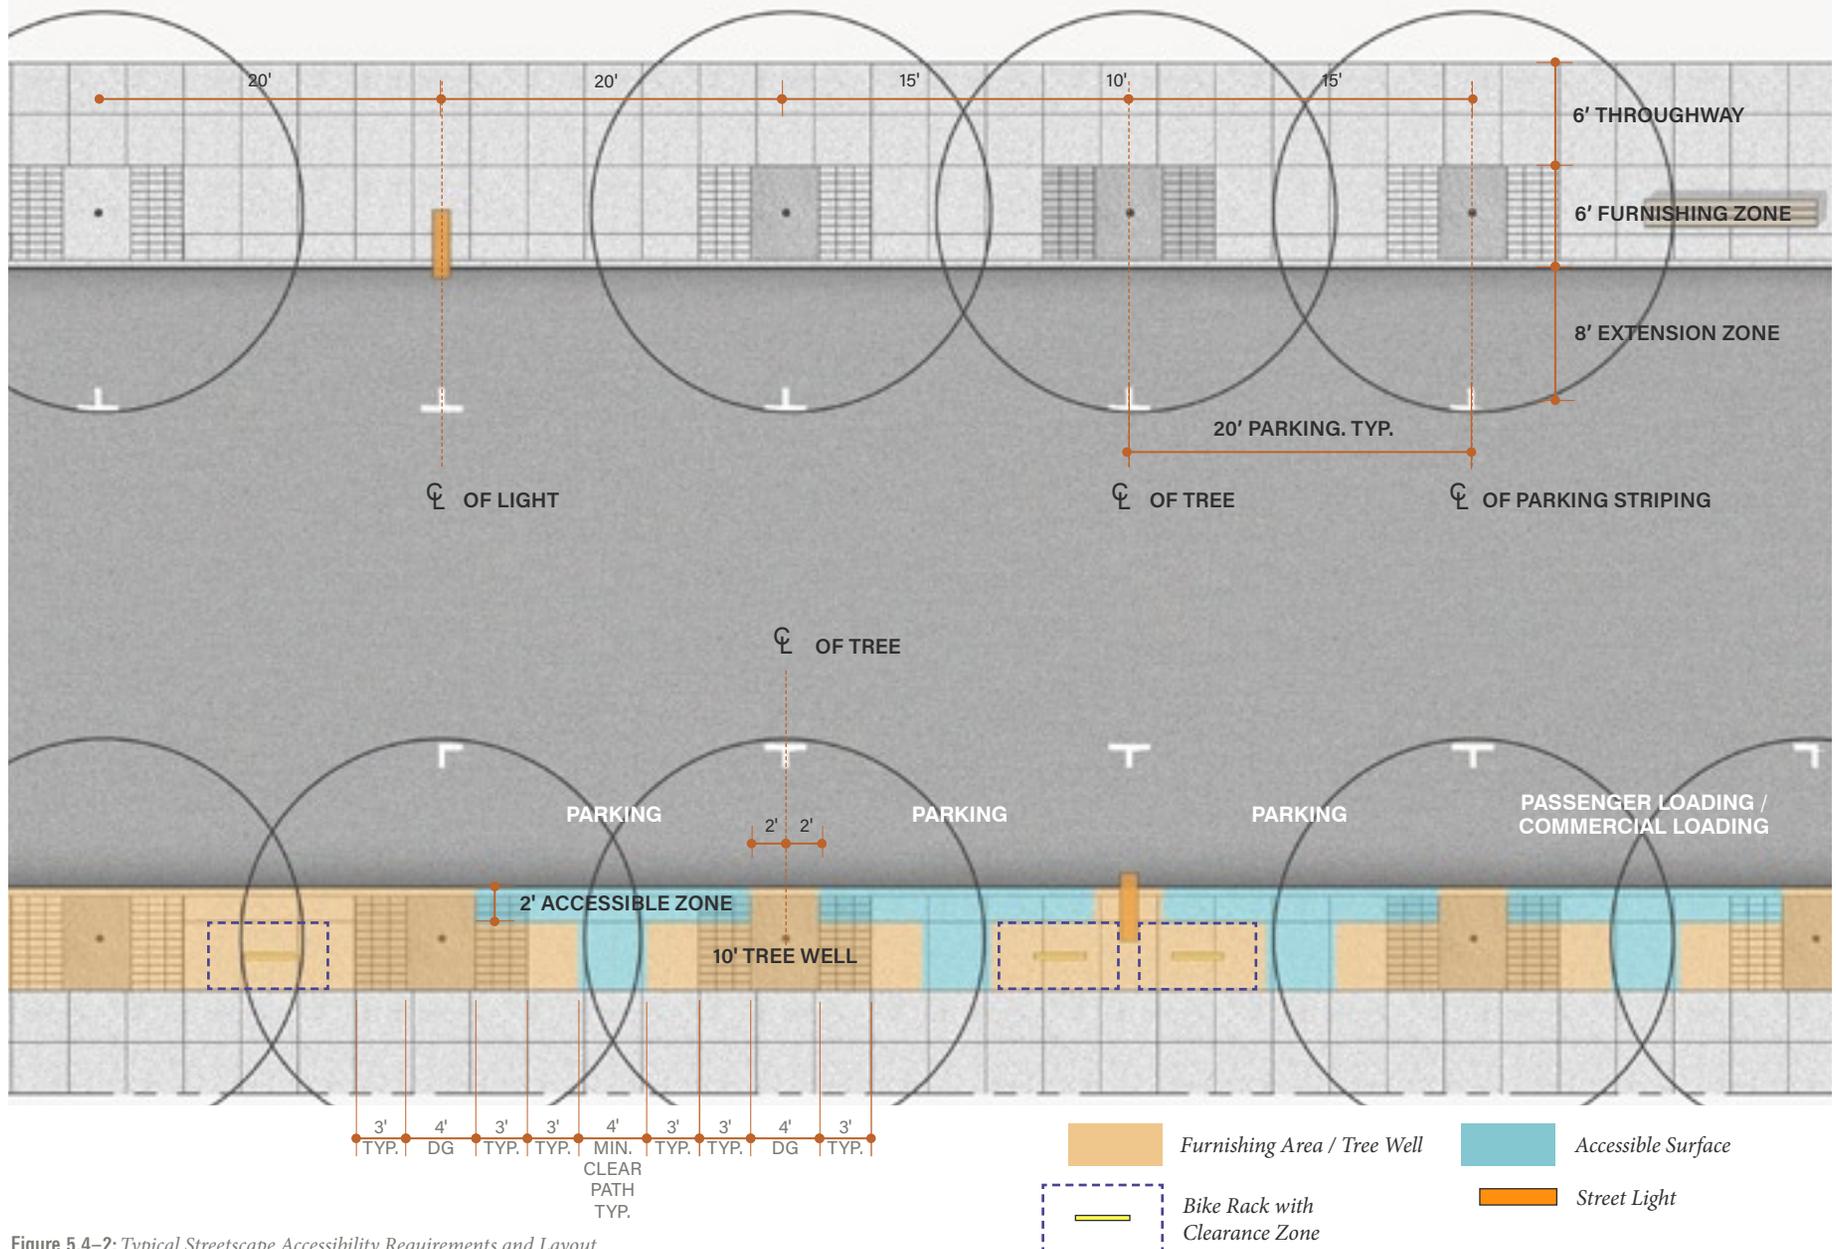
Typical Streetscape Accessibility Requirements and Layout
